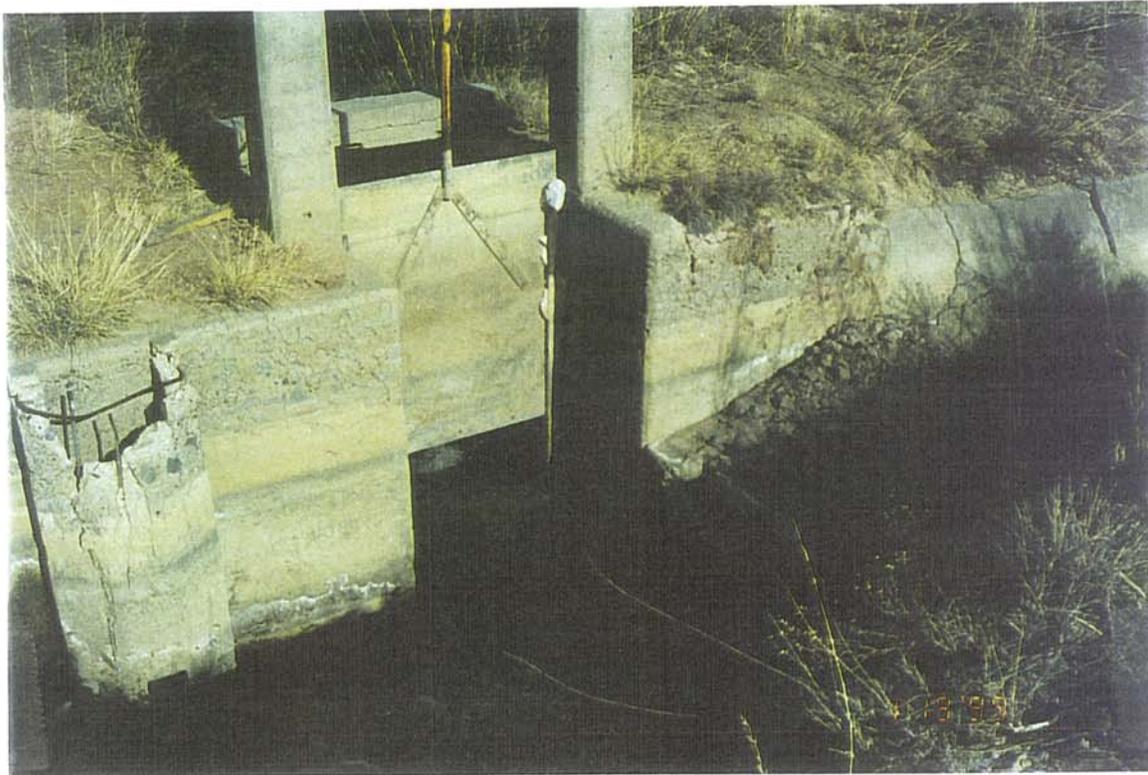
Casa Blanca Ditch at Philadelphia Diversion (Laguna Pueblo) - Headgate from ditch to river. The concrete has deteriorated and the gate leaks because it cannot seat properly.
